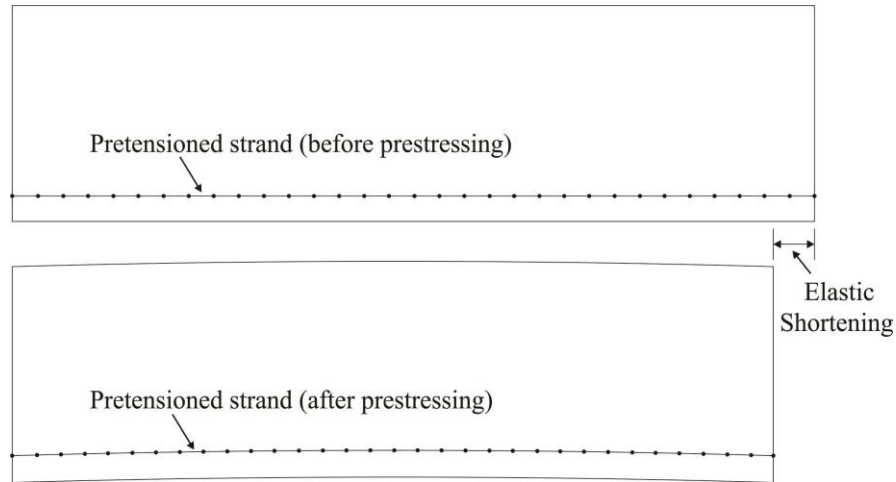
Elastic shortening on concrete beam due to prestressing of pretensioned strand
